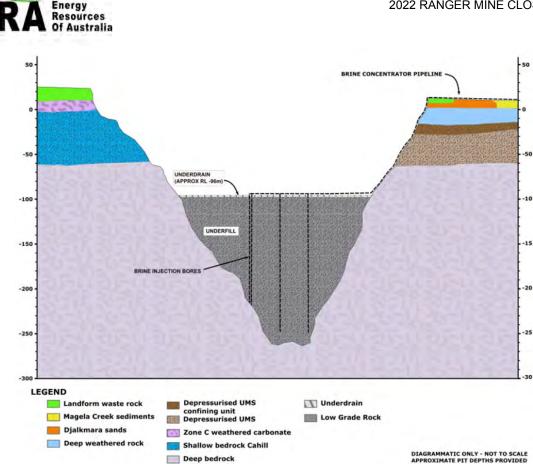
Schematic cross-section of Pit 3 before tailings deposition commenced
